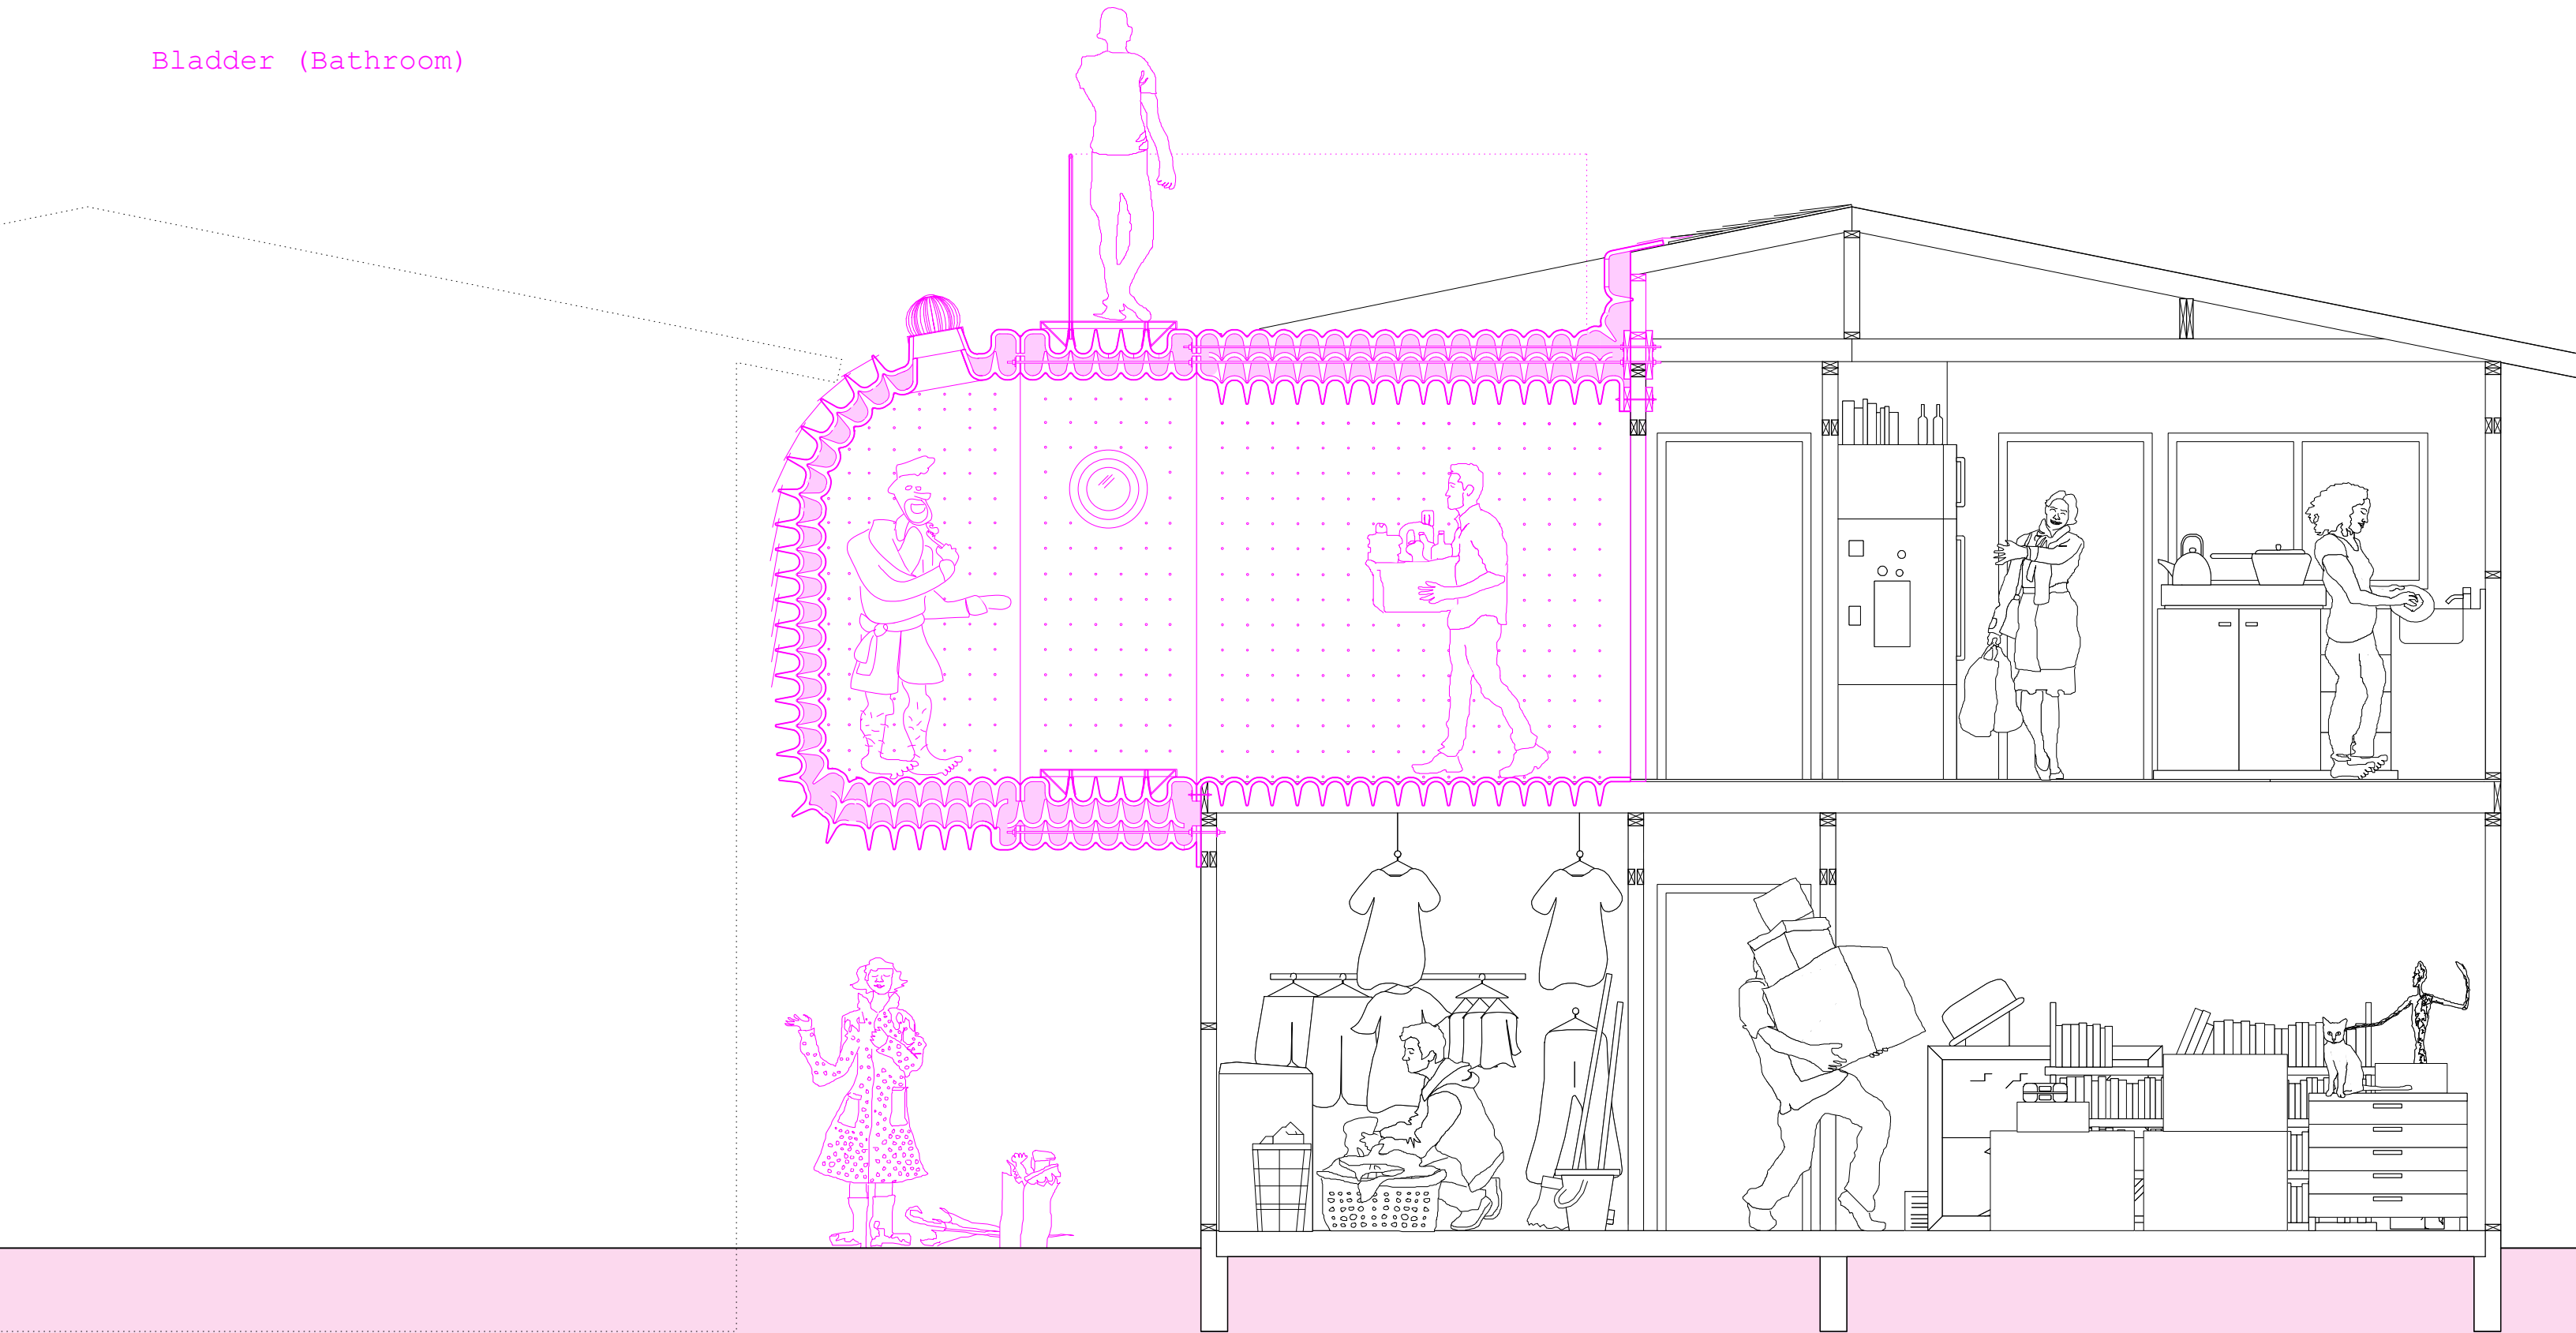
The Bladder: Building Section: plastics entering same space as human toothbrushing
